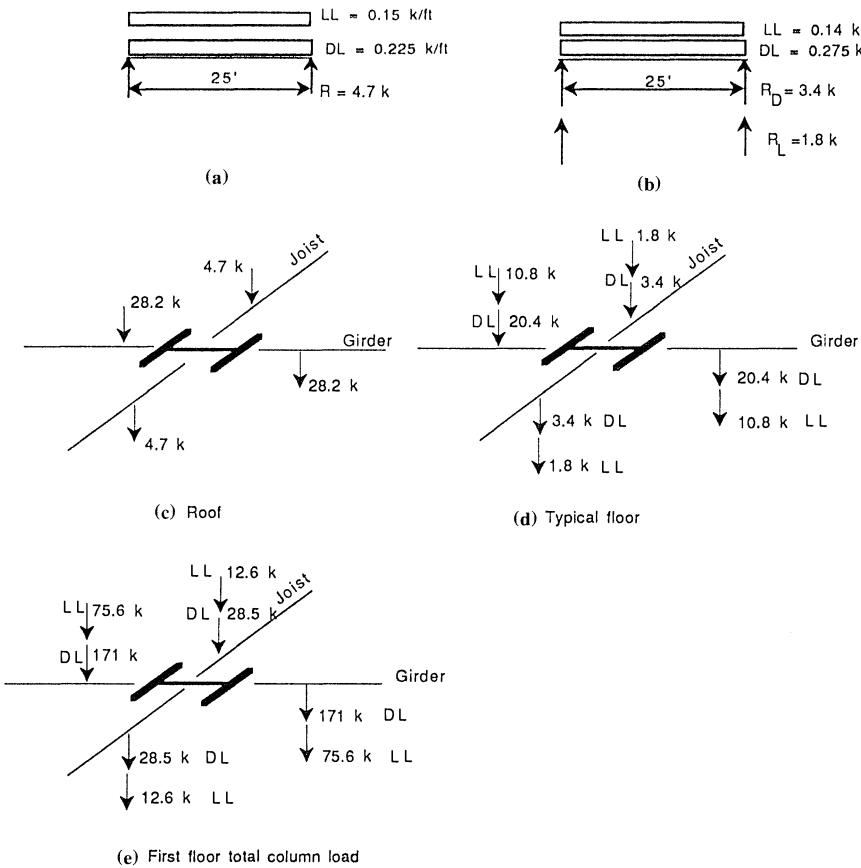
Interior column load calculations for the first floor. (a) Typical roof joist loads. (b) Typical floor joist loads. (c) Roof. (d) Typical floor. (e) First floor total column load.
